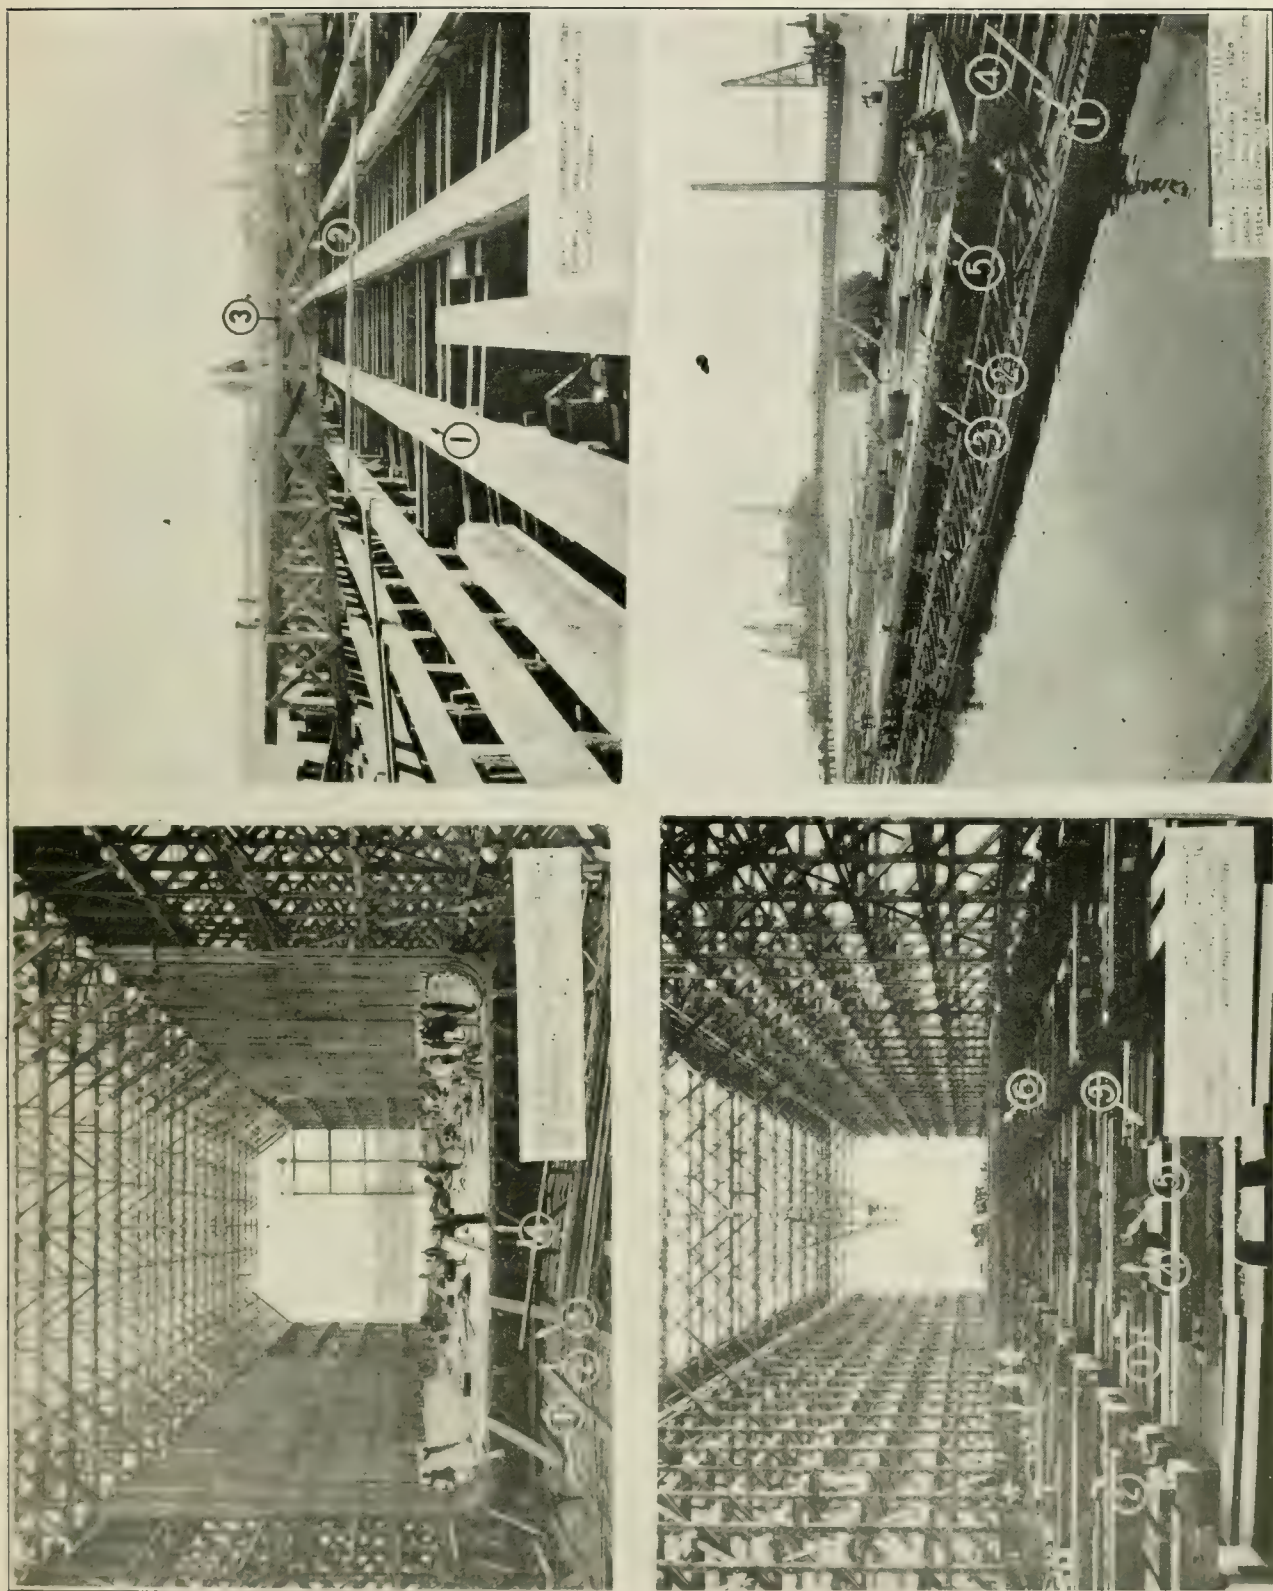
UNDERPINNING OR BLOCKING FOR SUPPORTING THE FLOOR FORMS, AND THE SCAFFOLDING, WITH OVERHEAD TRUSSES FOR SUPPORTING THE OUTSIDE FORMS, ARE ERECTED.
